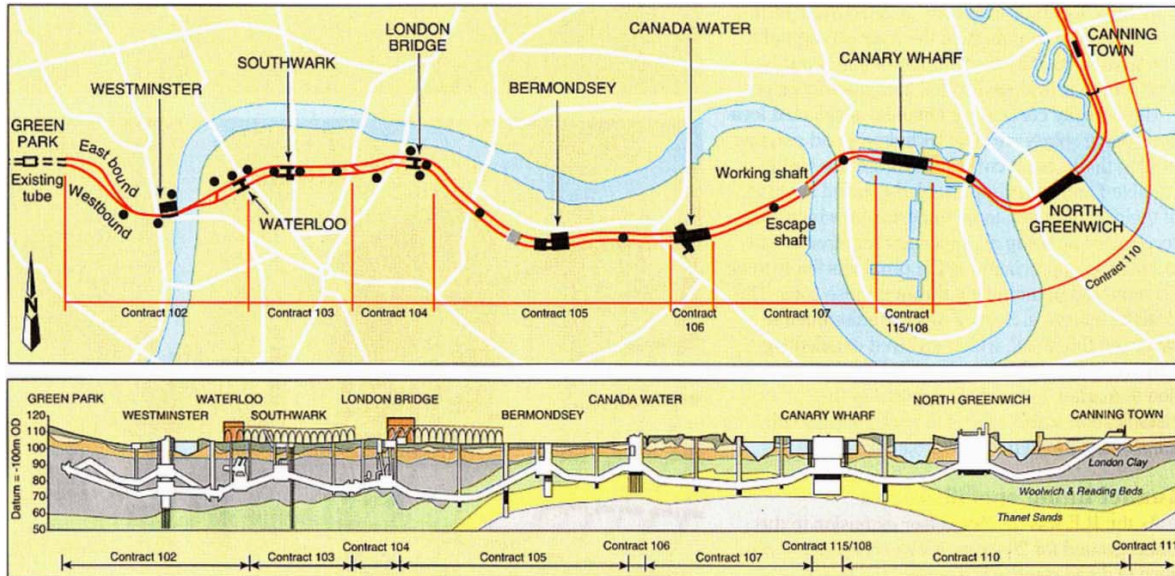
Plan view and cross section of the JLE route (source: Davies 2000).
